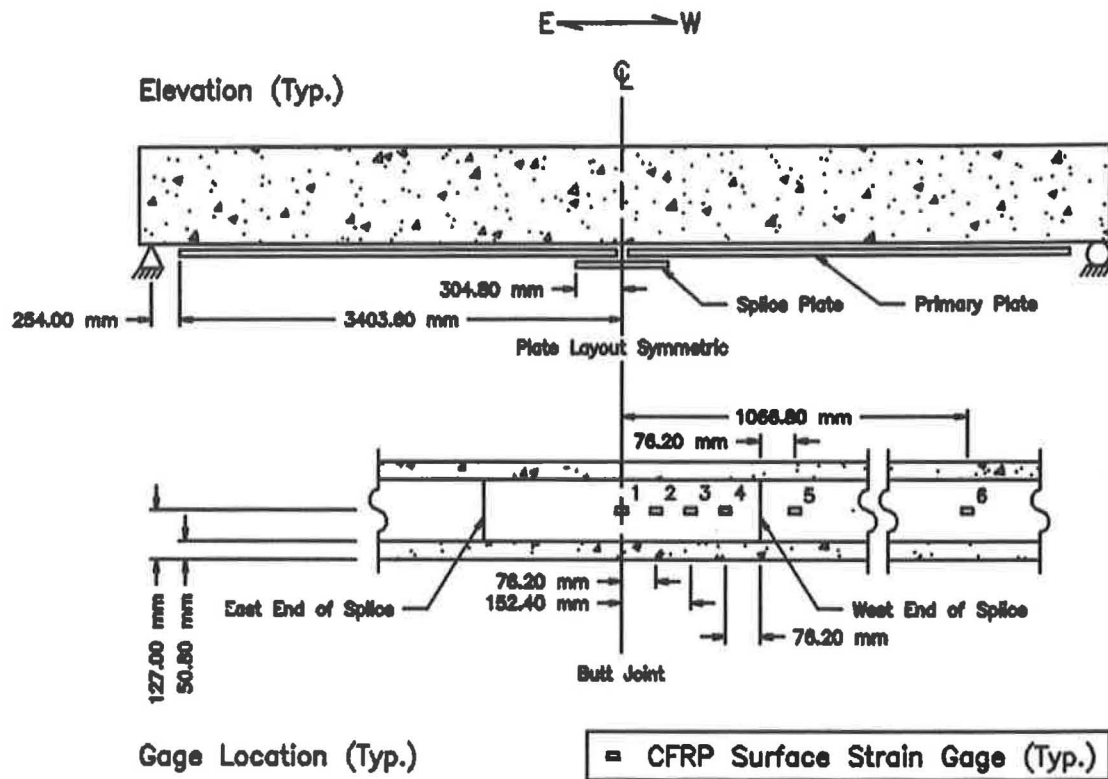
CFRP Plate Layout and Gage Locations, Beams 1 and 2 (FT)
